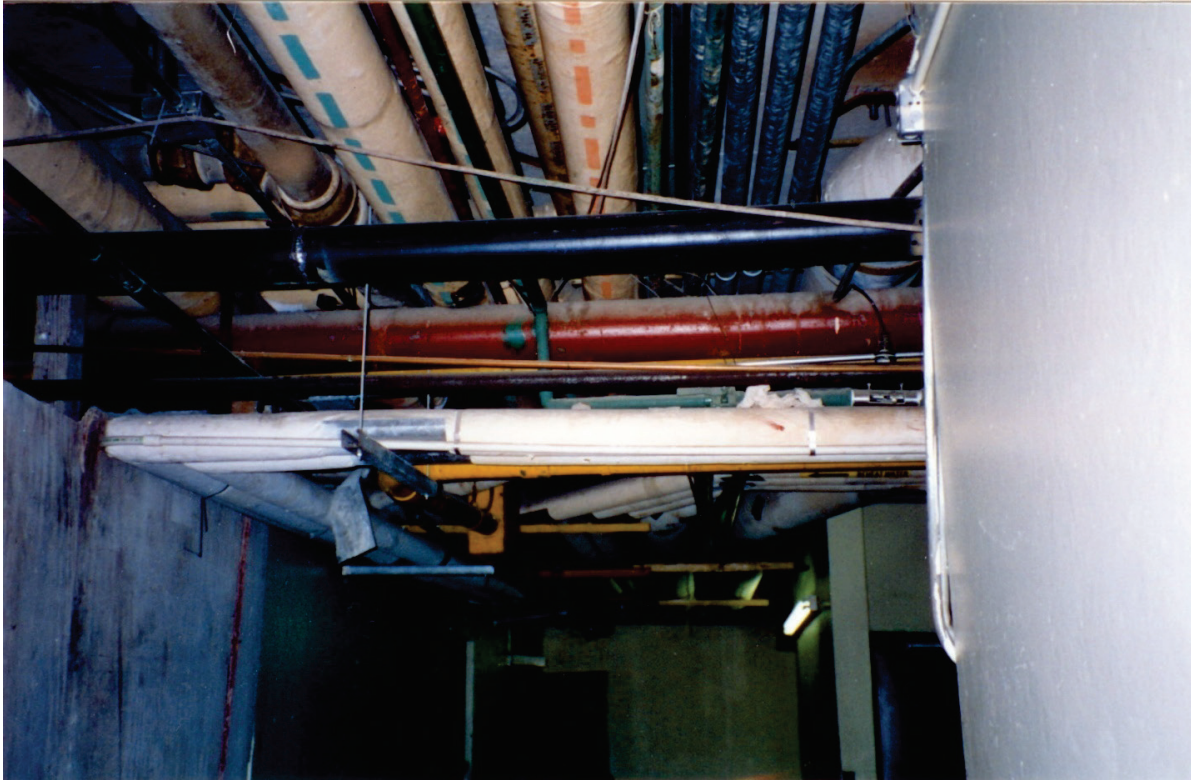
Unbraced suspended piping and conduit (Photo courtesy of Wiss, Janney, Elstner Associates).
